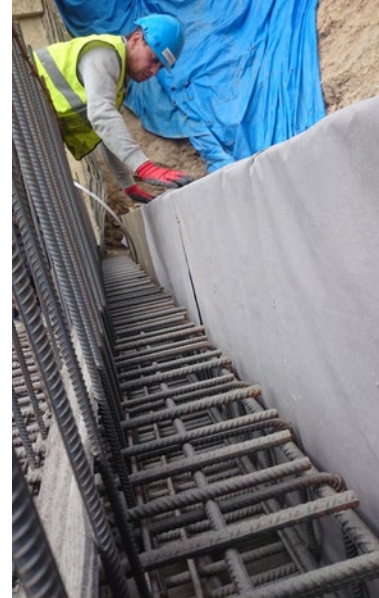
The side of a foundation slab and an elevator shaft pit waterproofed with Hydrostop-Penetrating Mat.
